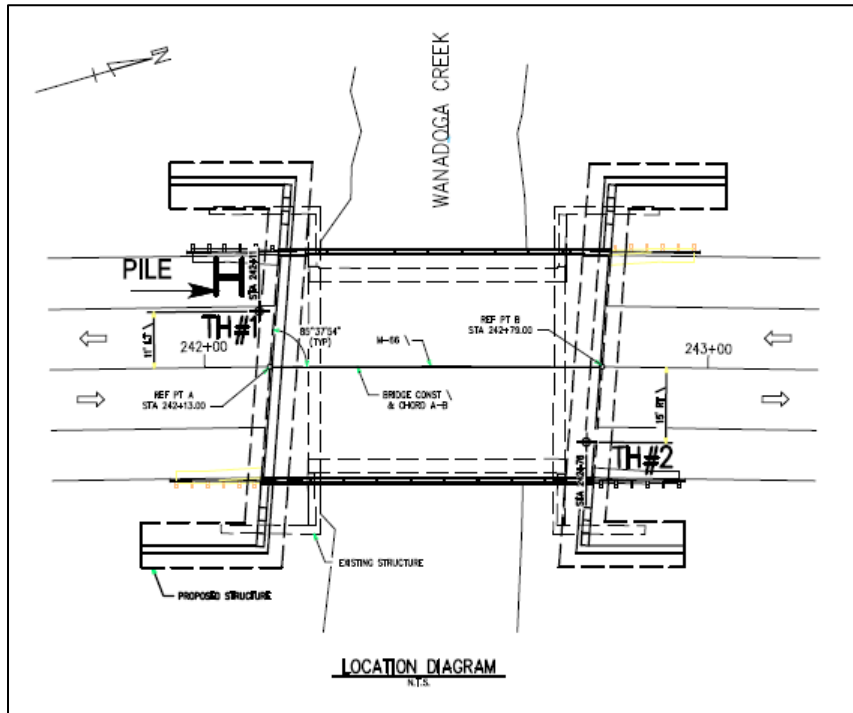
Locations of tested pile and test holes at M-66 Site
